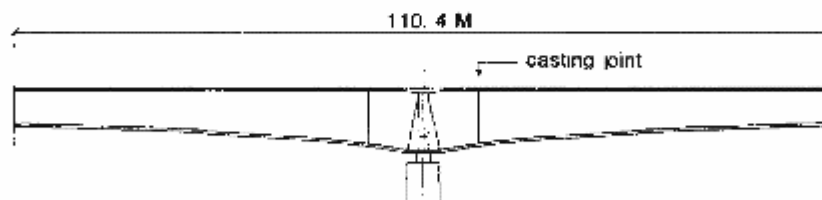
Precast concrete bridge superstructure: longitudinal section.
